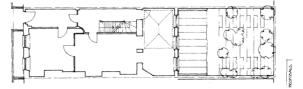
1989 Ground floor plan of no.29 Great James Street
